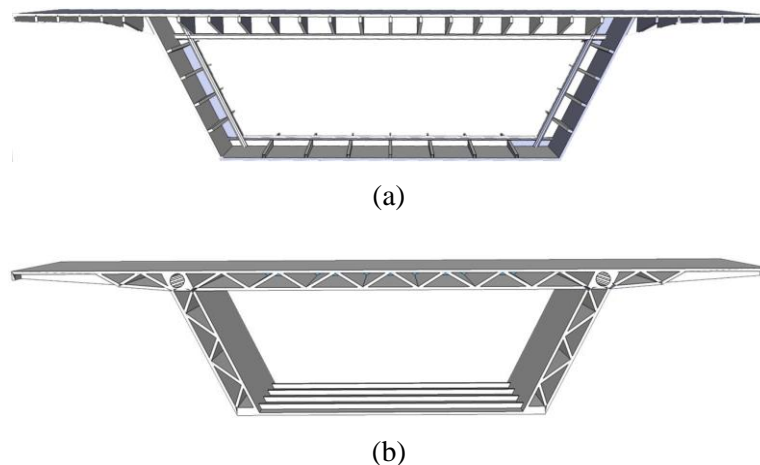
UHPC concept segment designed by [Reichel 2010]: (a) Precast segment with rib and stiffener (b) Precast segment with truss structure and stiffener
